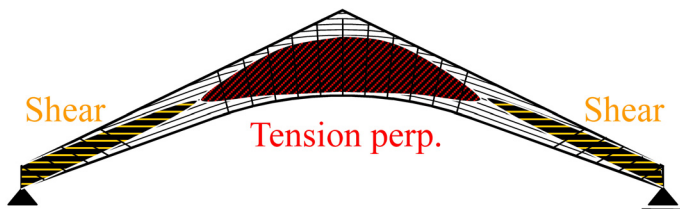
Pitched cambered beam – potential reinforcement zones (from [59])
